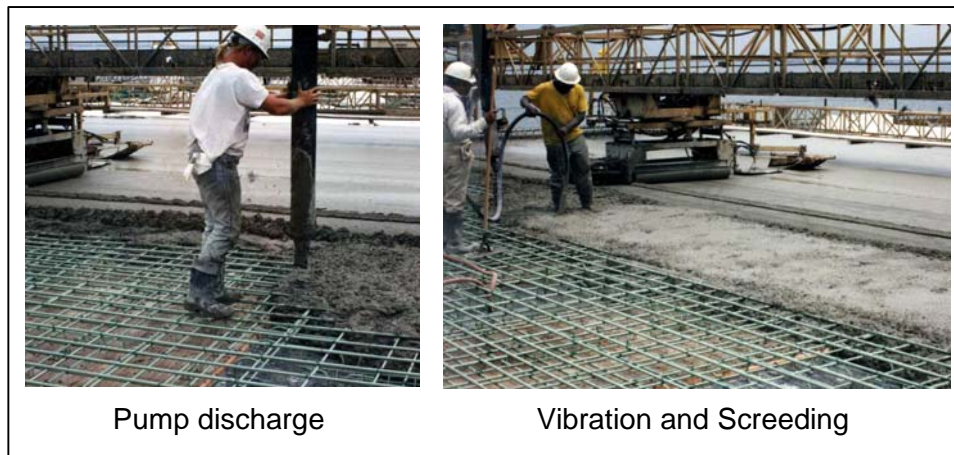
Placing, Consolidating and Screeding Concrete Slab
